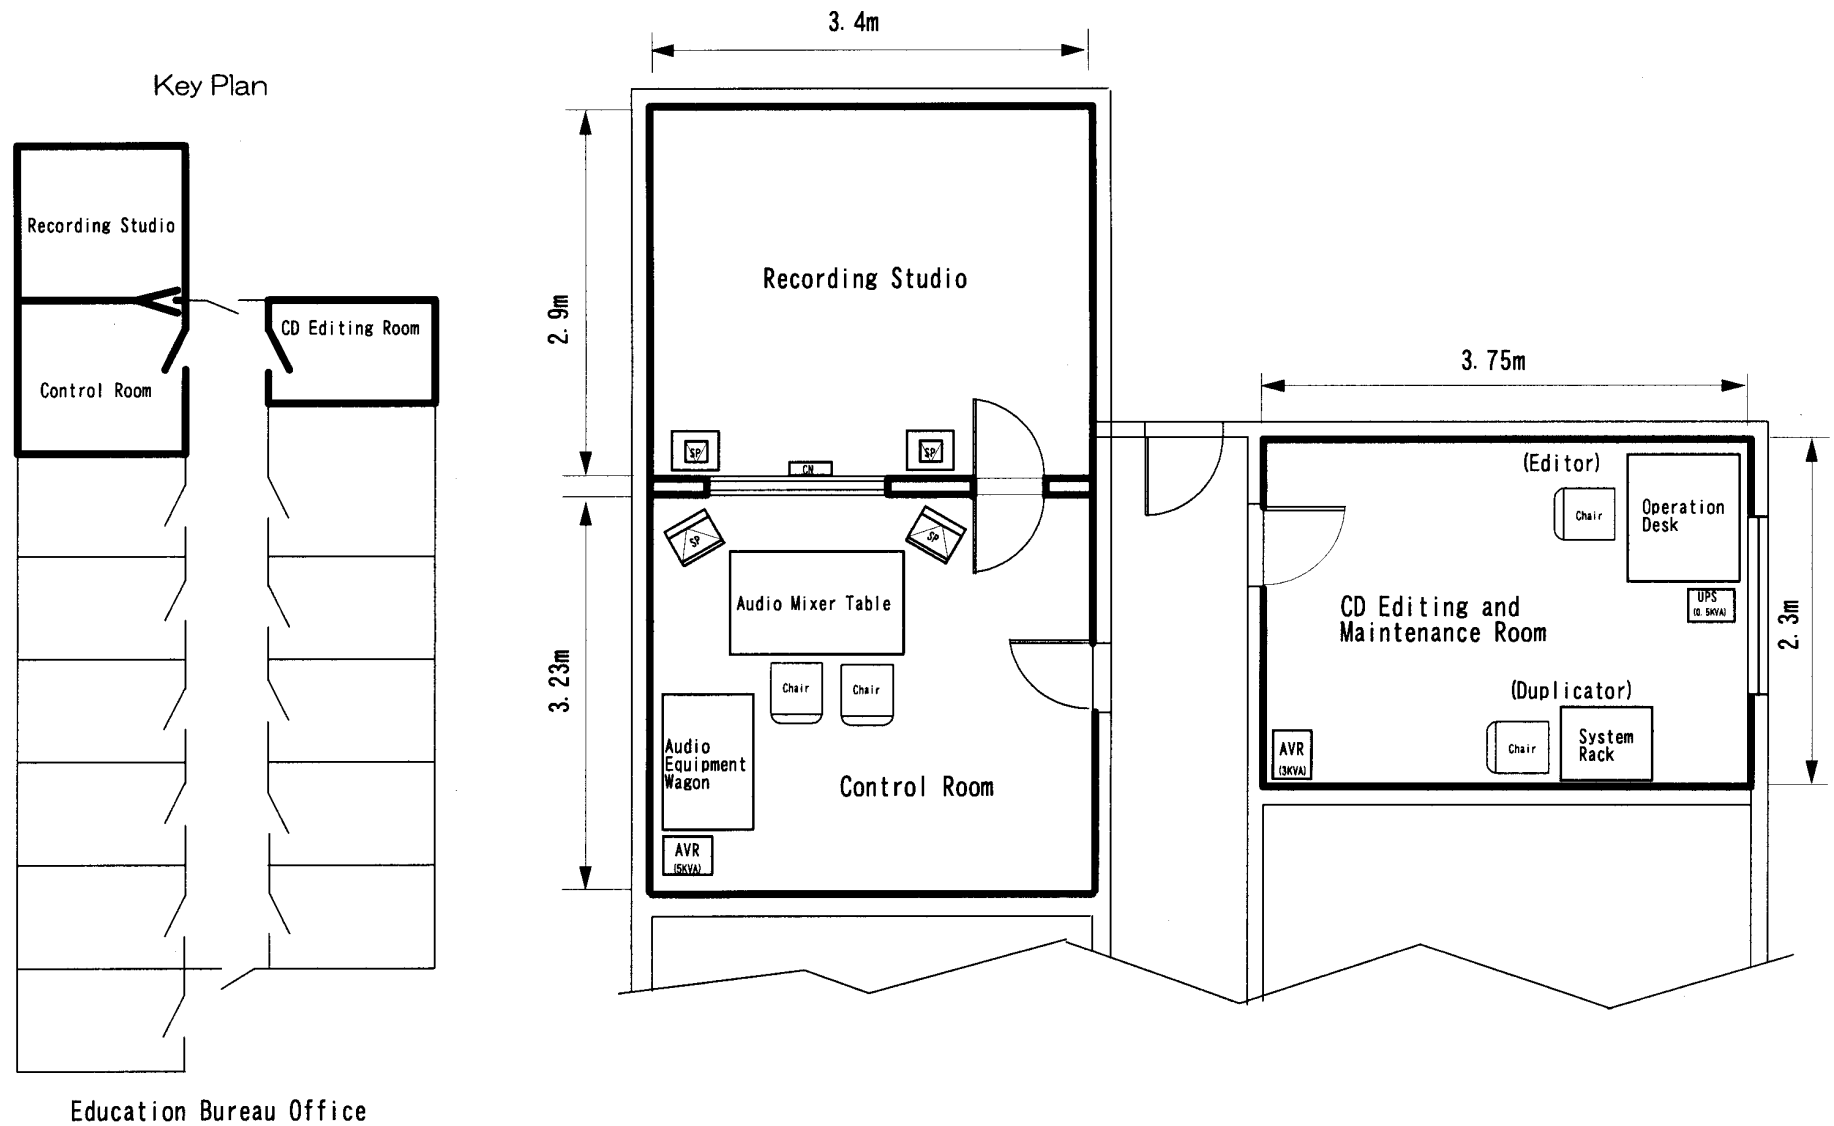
Floor Layout of Mizan Teferi Radio Studio
